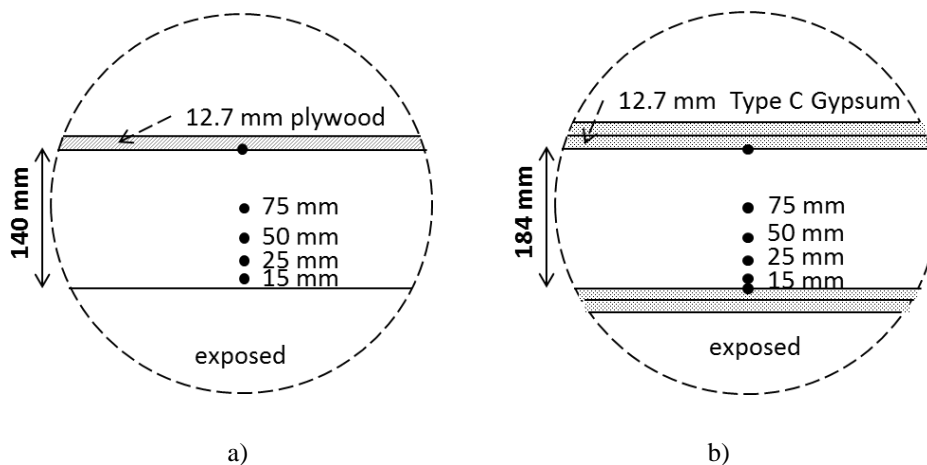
a) 2x6 NLT wall and floor detail; b) 2x8 NLT wall detail
